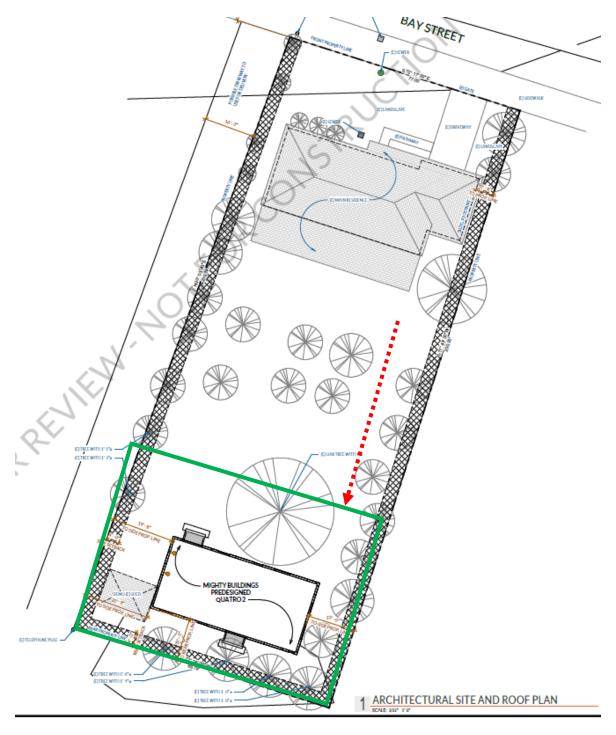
the site plan for the project. The proposed ADU and its area to impact roots is shown in green. A path of travel will need to be established and routed outside of the dripline of any protected tree. The recommended path of travel is shown with a red dashed line.
